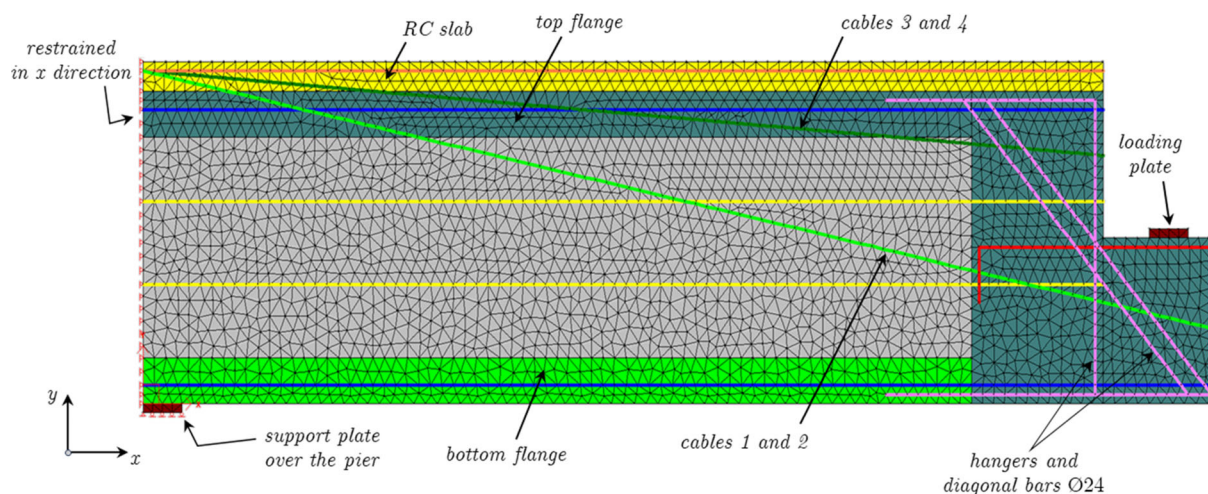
2D nonlinear finite element model of the Gerber half-joint through the VecTor2 software⁴², by using triangular elements for concrete and discrete embedded truss elements (combined with smeared reinforcement) for steel reinforcing bars and prestressing cables. RC, reinforced concrete.
